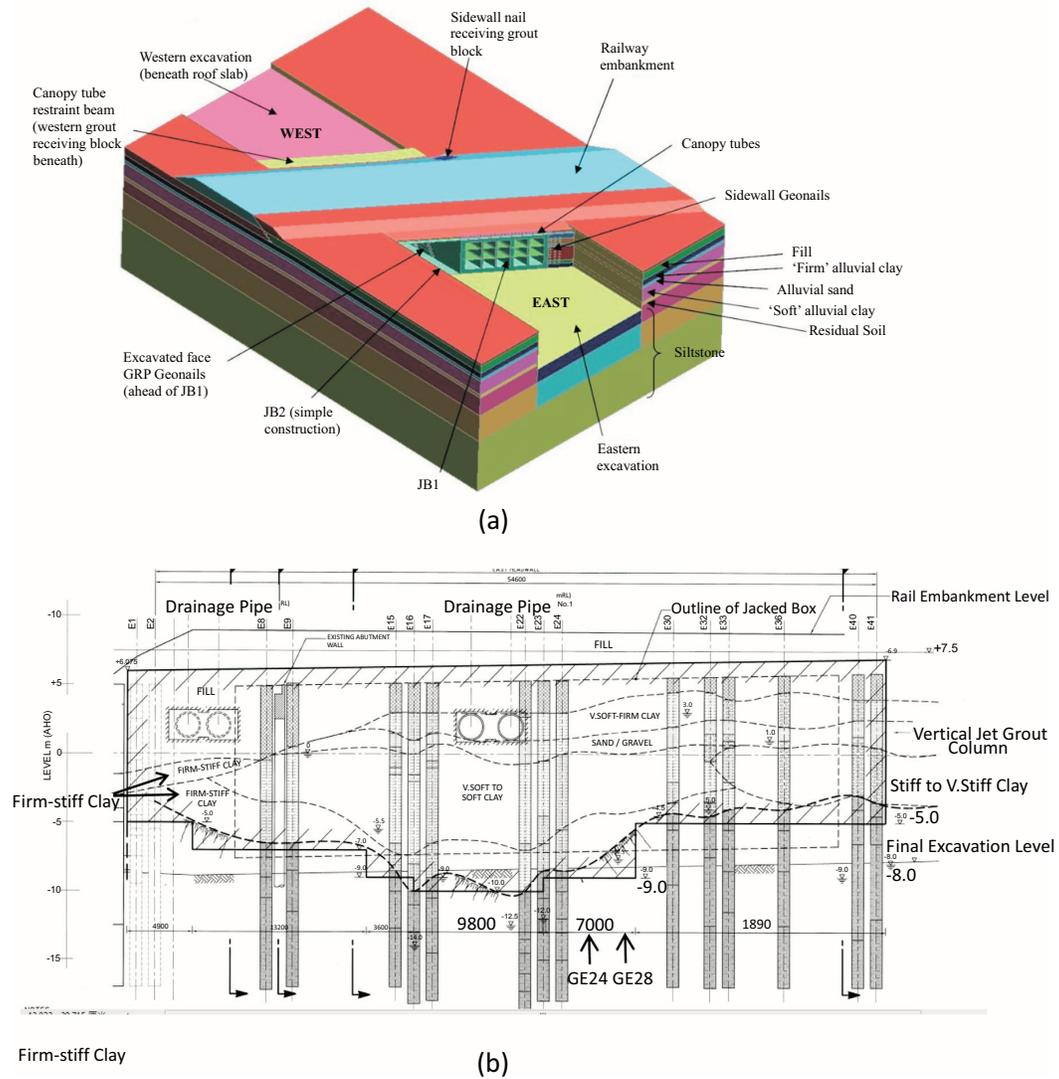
(a) Geological condition for the tunnel project in soft clay, (b) a typical section of the tunnel work.
